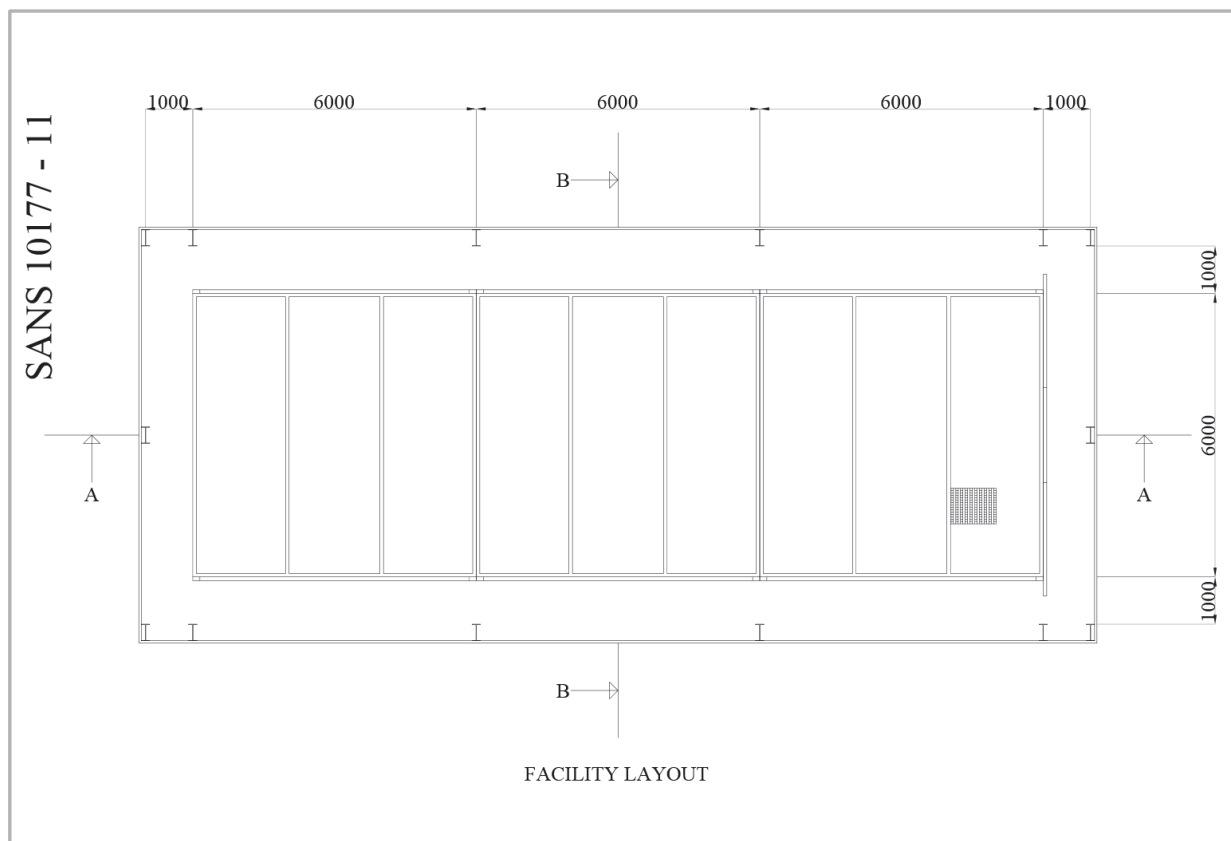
SANS 10177 – Part 11 test facility with specimen frames
